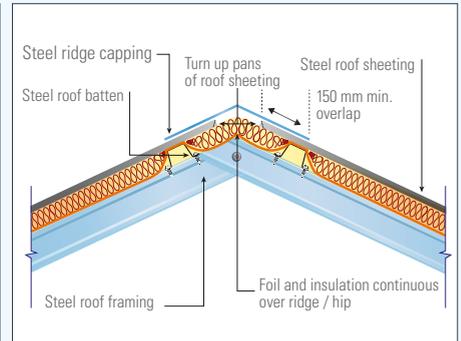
Roof system – ridge/hip details, BAL-FZ
